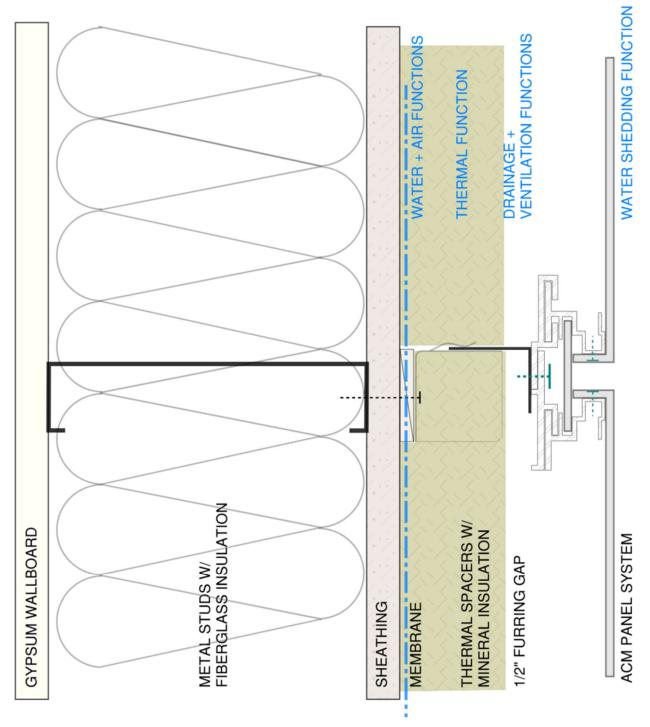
Assembly C – ACM, furring, membrane, sheathing
